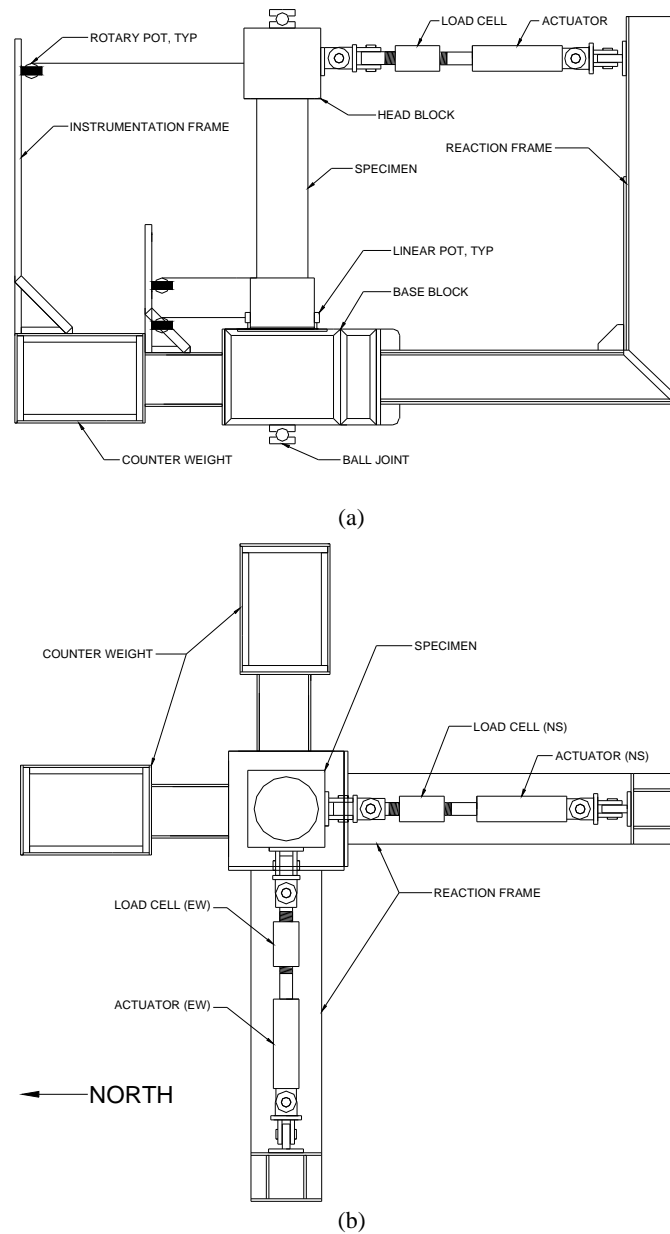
The testing setup: (a) EW elevation; (b) plan view.
